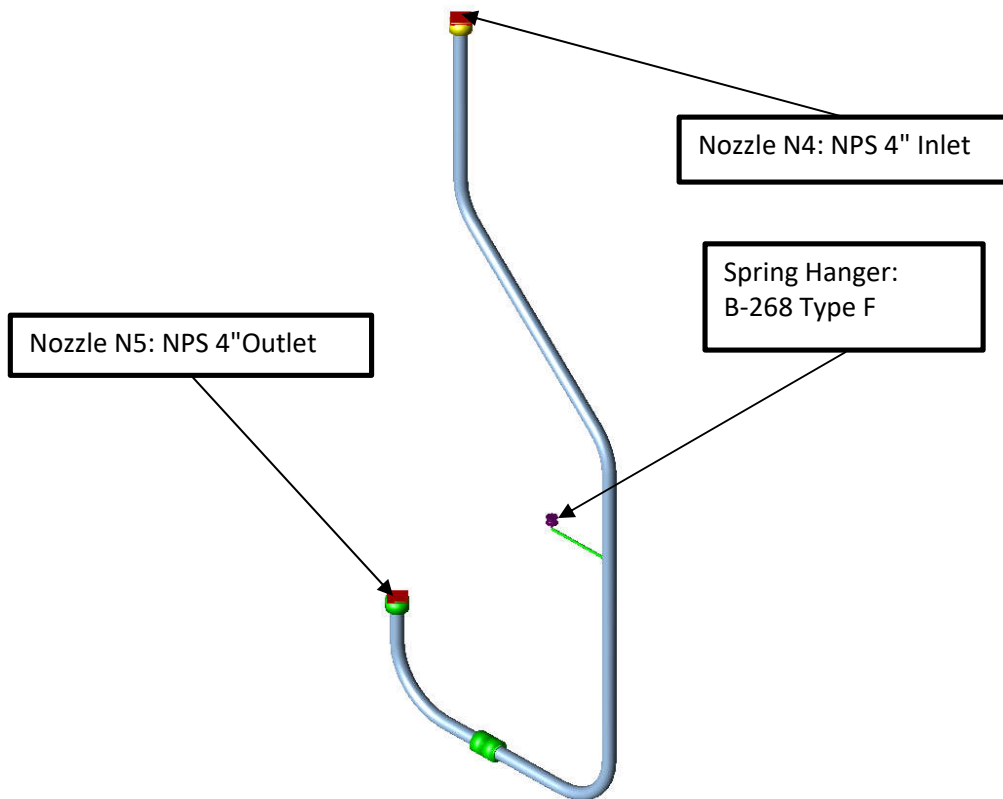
NPS 4" Connecting Inlet and Outlet Piping
